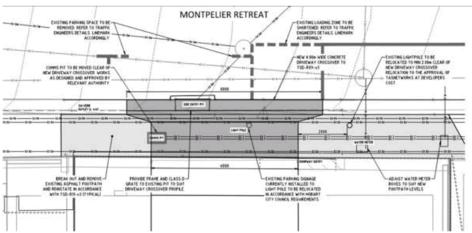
Proposed work in the road reserve. Source: Application documents.
